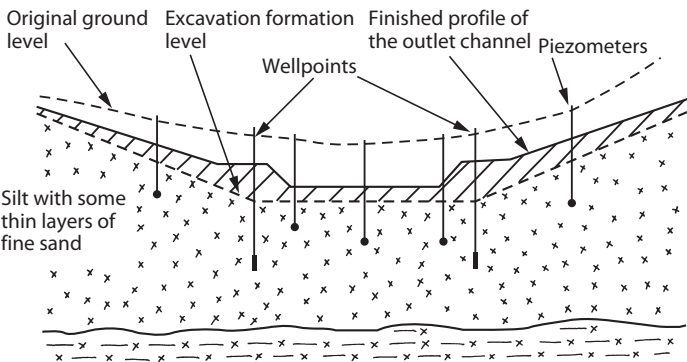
Typical cross-section of the Derwent outlet channel. (Courtesy of Northumbrian Water Limited, Durham, U.K.)
